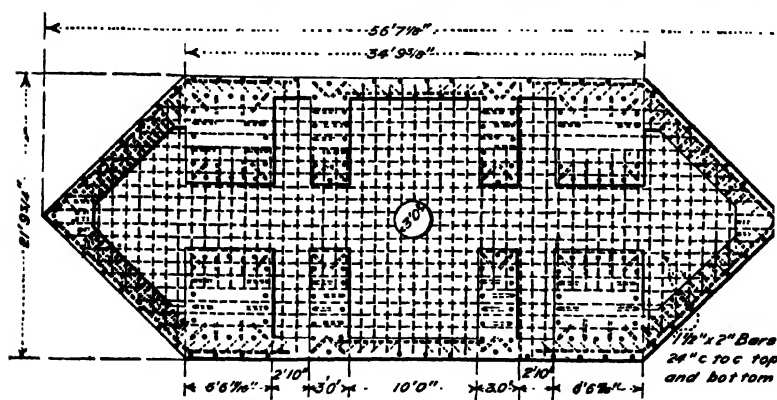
Typical Channel Pier, Sparkman Street Bridge, Nashville, Tenn. Arched above and hollow below starting-coping course.
